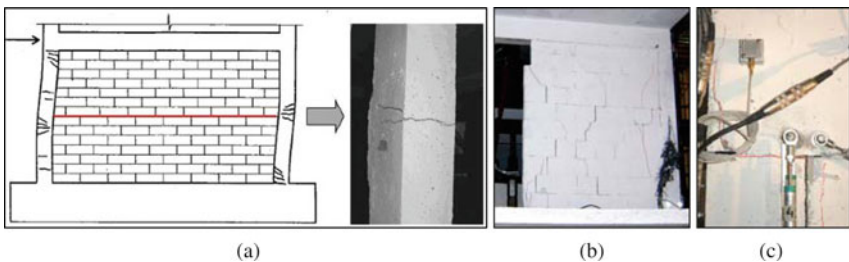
(a) Shear-sliding mechanism of the panel and cracking at mid-height of column C1; (b) damage in masonry infill; (c) damage at the top of column C1 at the 1st storey
